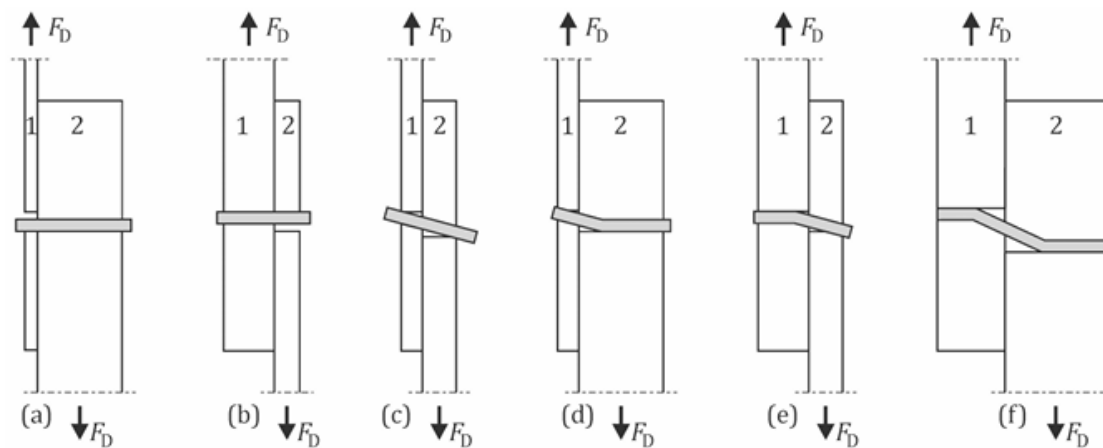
Failure modes for fastener loaded in single shear a) to f).
